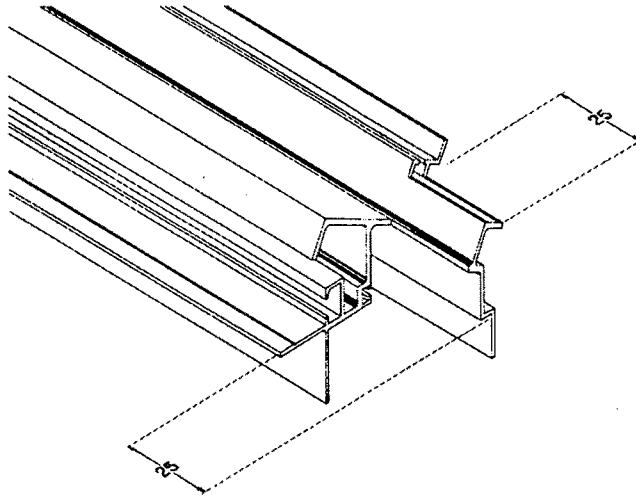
Processing drawing of eaves finishing member("F" details)
